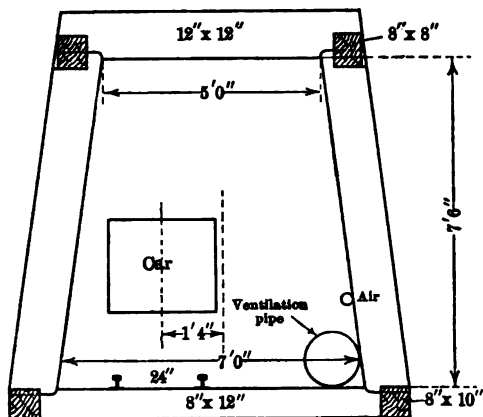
Arrangement of timbering providing a manway at one side of the tunnel.
